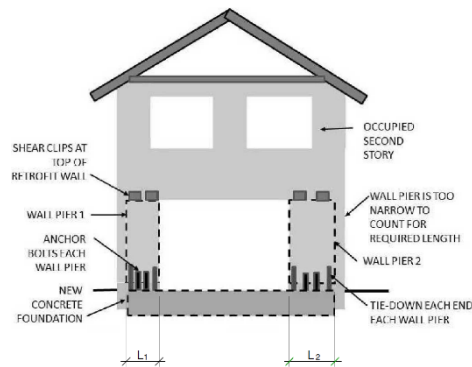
Schematic elevation of the living-space-over-garage vulnerability showing new seismic retrofit elements either side of the garage door. [1]
